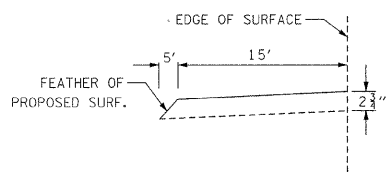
DETAIL OF INTERSECTION 233+37 LT AND 234+10 RT
